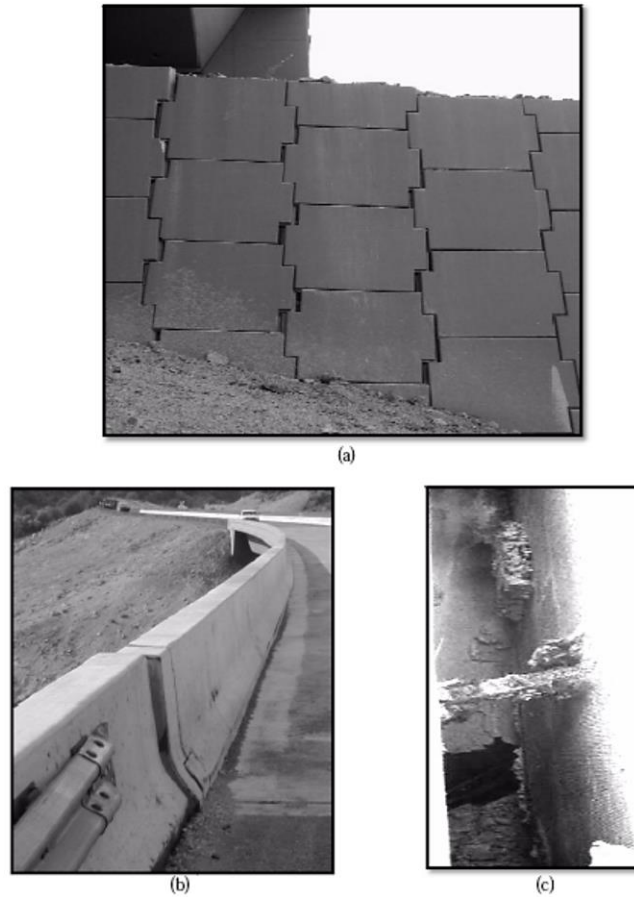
(a). Openings Between the Panels of the MSE Wall (b). Outward Rotation of the Wing Wall (c). Separation of Wing Wall from Abutment (Samtani et al., 2005)
